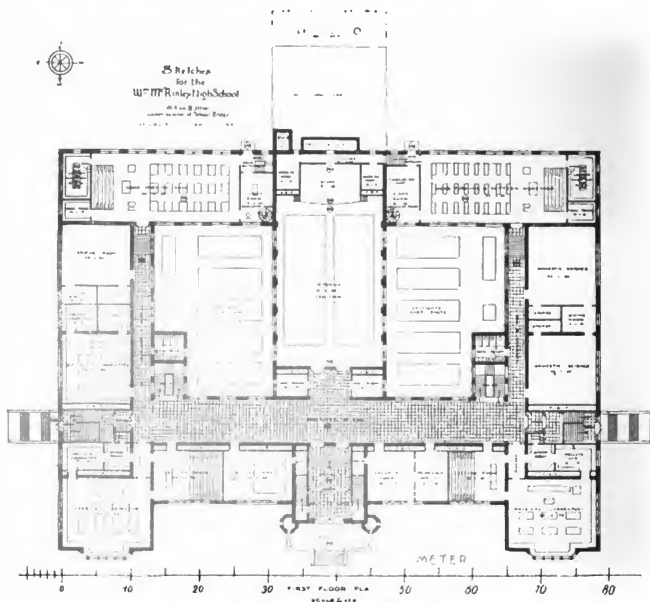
FIRST FLOOR PLAN, WM. MCKINLEY HIGH SCHOOL.
